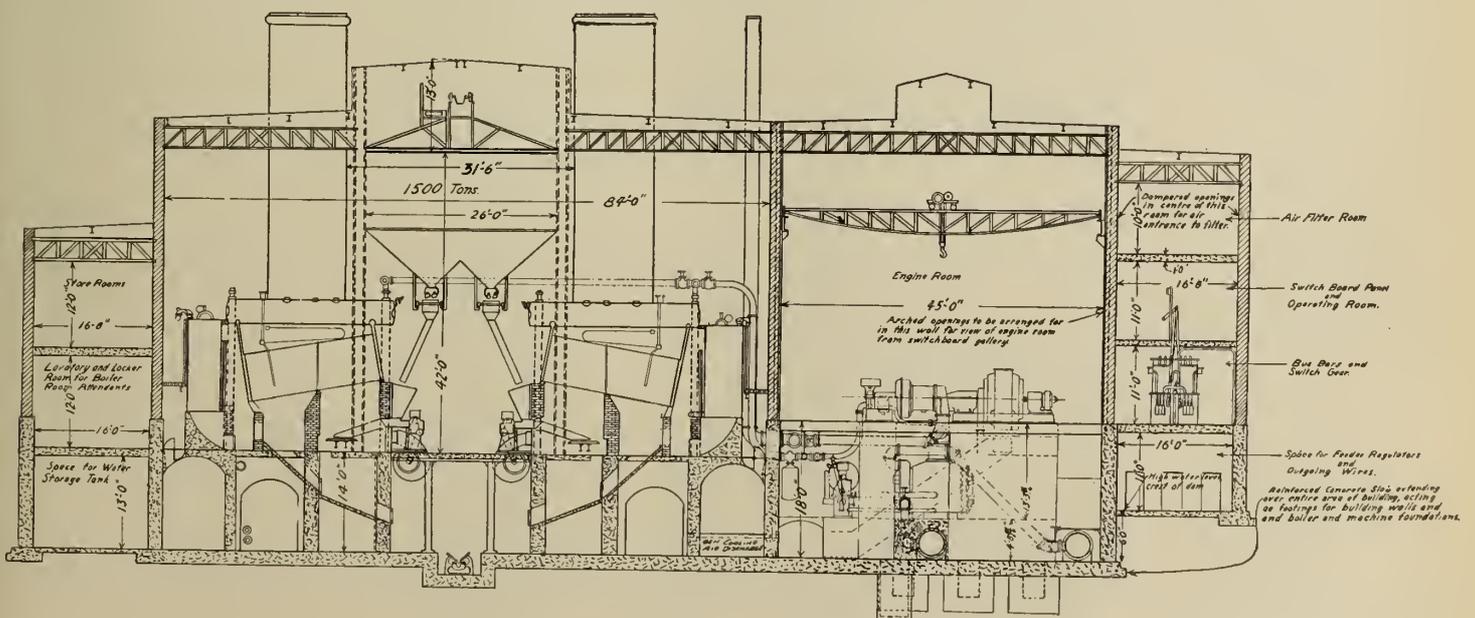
Arrangement of Equipment for Regina City Power Plant.
